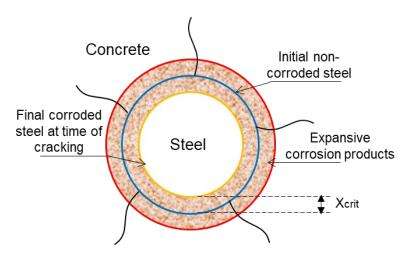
Average cross-sectional steel loss to cause cracking of the concrete.
